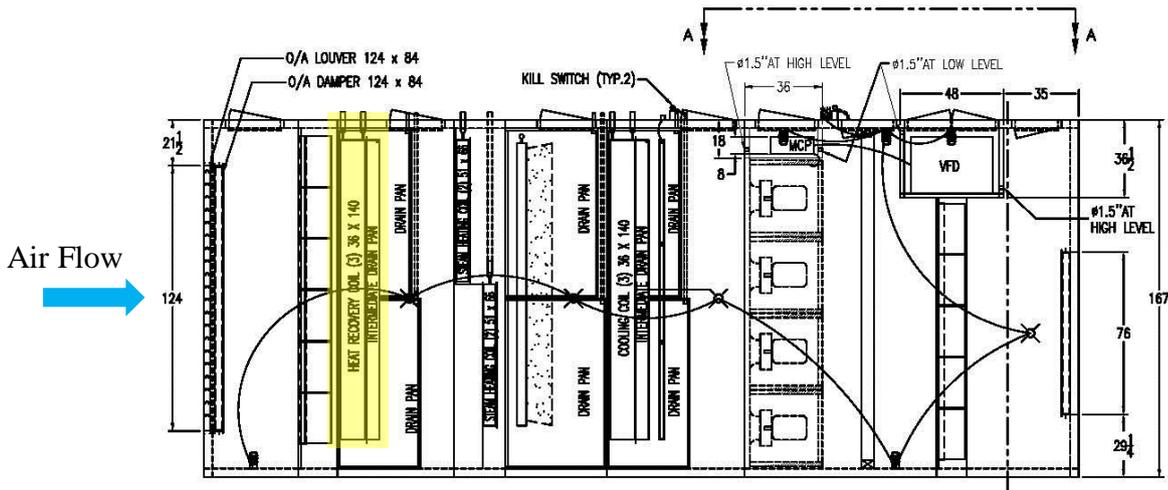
Typical Plan View of Air Handling Unit with Heat Recovery Coil
